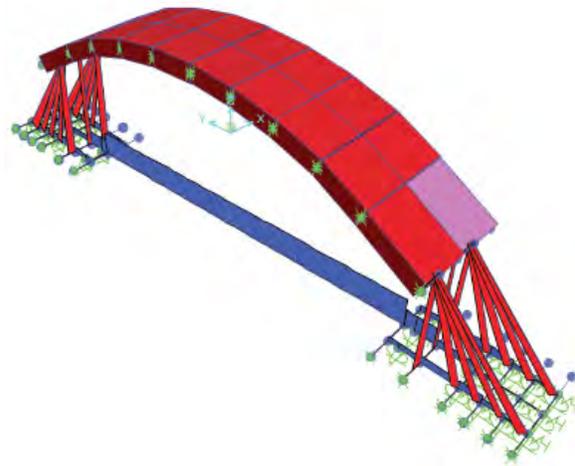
FEM Model of Colonial Parkway Arch. FEM modeling will help our team design and build a structure that is compatible with the existing arch.
